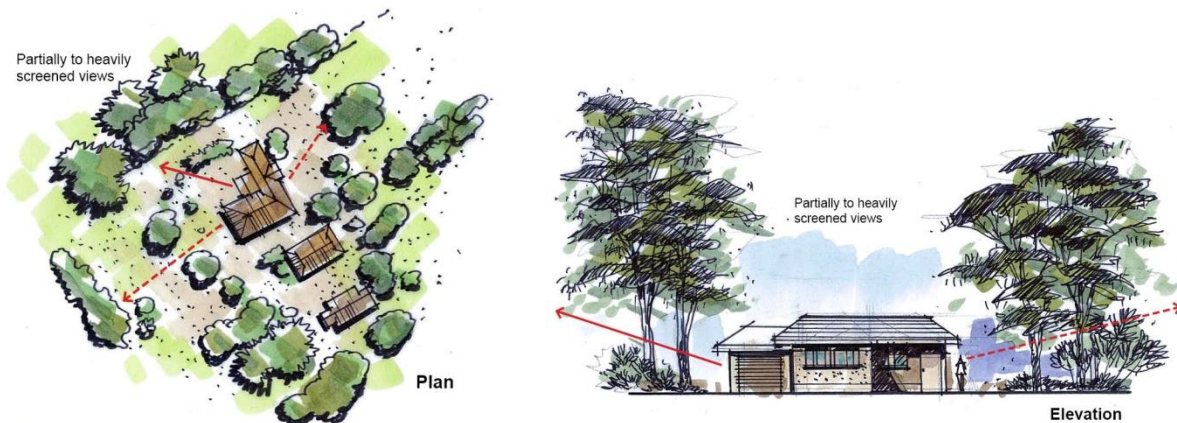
TYPOLOGY 2 – TYPICAL PLAN AND SECTION
